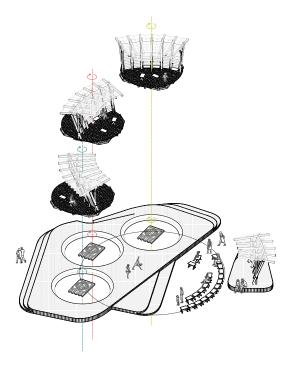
Mounted on disused slewing rings, the pavilion's segments can be turned to create a variety of spatial constellations on and around the "connective tissue" base.
